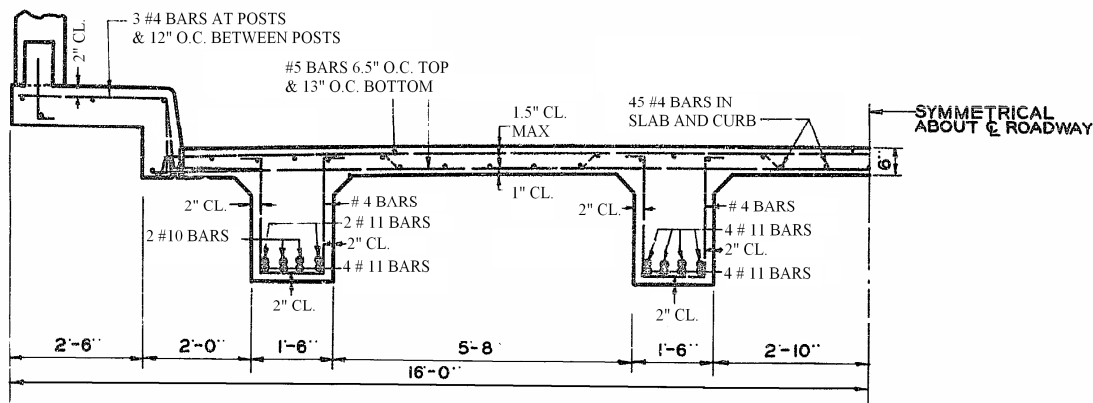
Deck and Girders Reinforcement Detail (Ref. GDOT Drawing)
